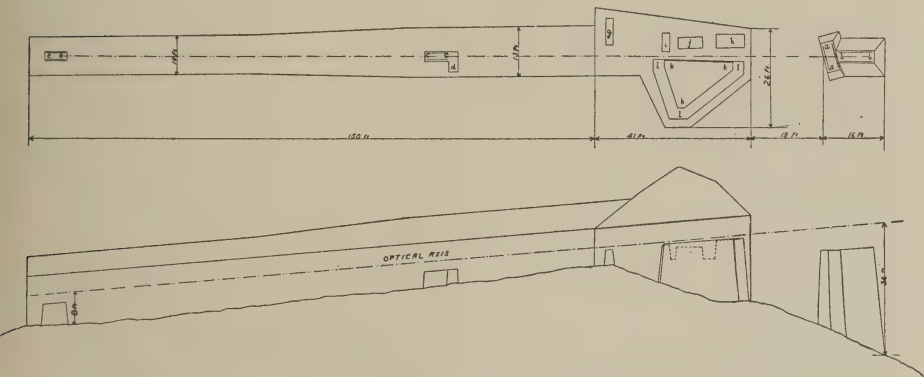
Plan and Elevation of Snow Telescope House on Mount Wilson.
